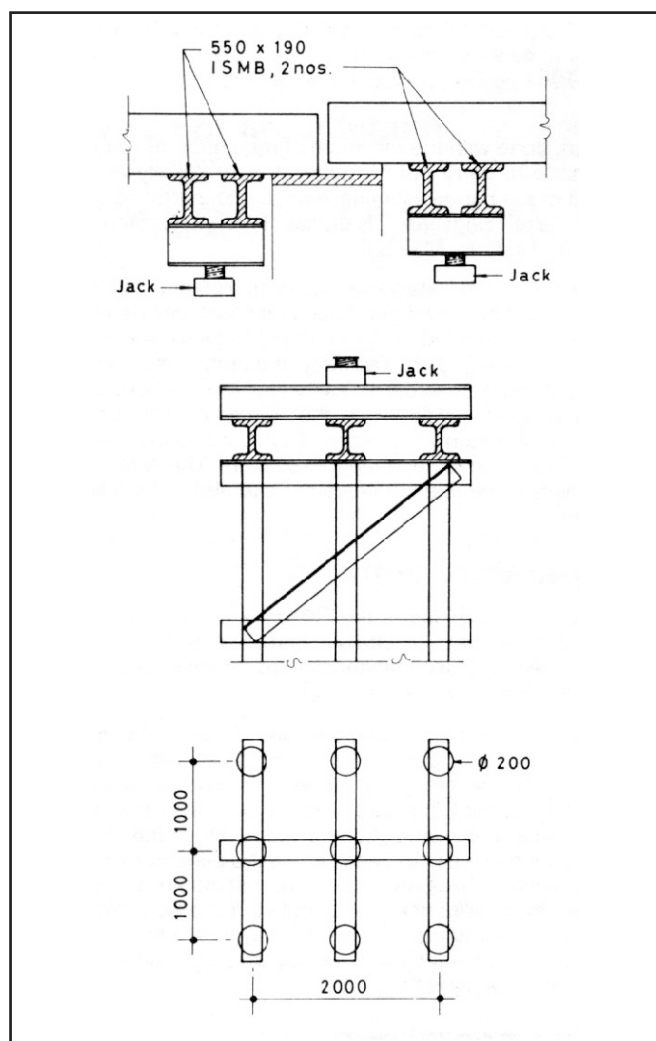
Lifting arrangements for piles and girders for Dharmadam Bridge
